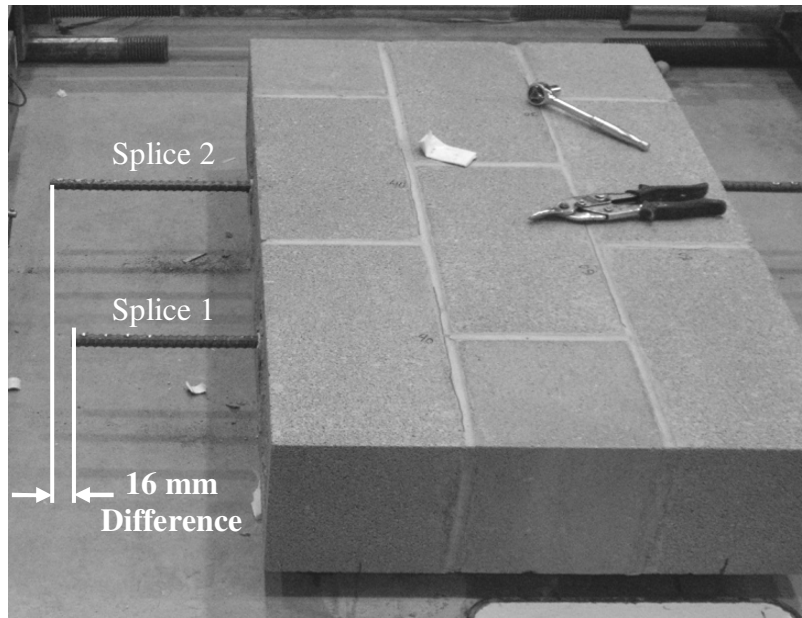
Bar pullout failure in - Specimen CP-6.
